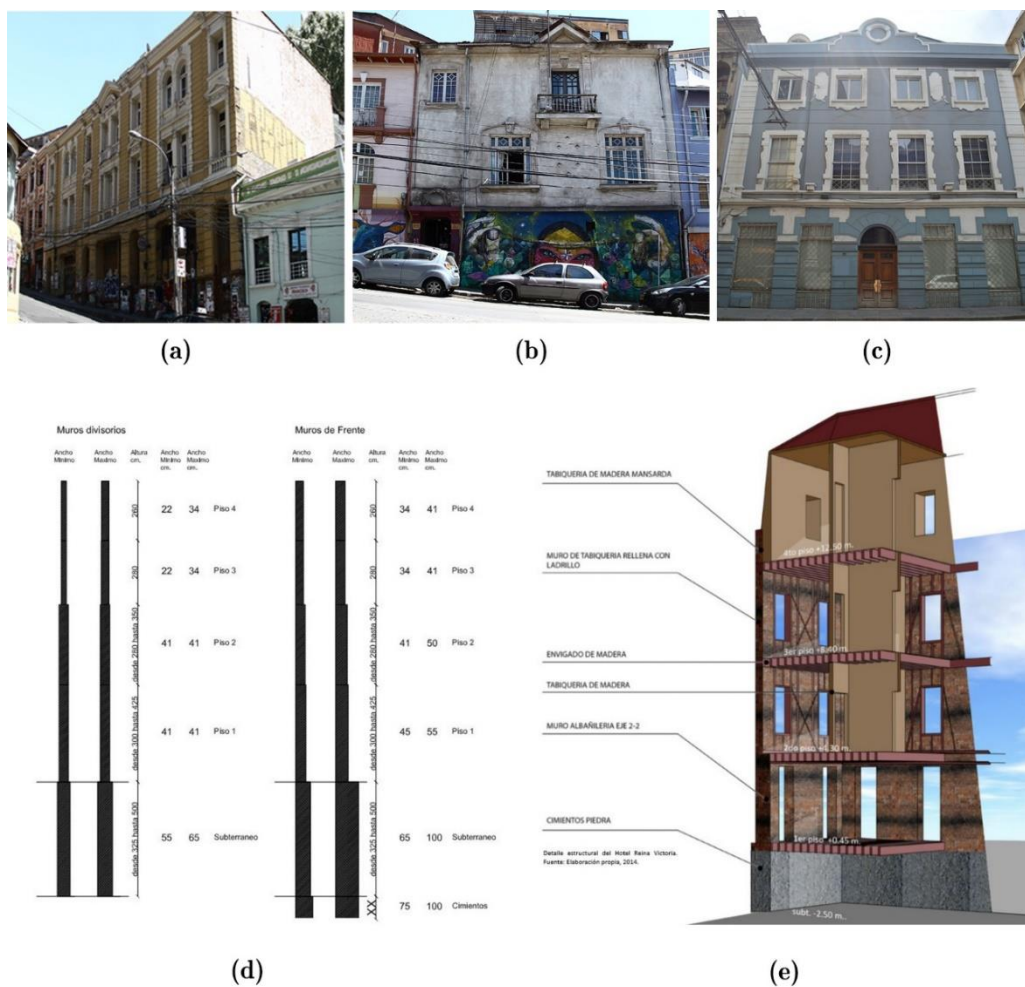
Typical features of masonry buildings in Valparaíso: (a-b) facades in Almirante Montt street, (c) facade in Arturo Prat street, (d) staggered masonry wall (images by Salazar (2014) and (e) main section of the *Hotel Reina Victoria* in Sotomayor square (by Salazar (2014)).
